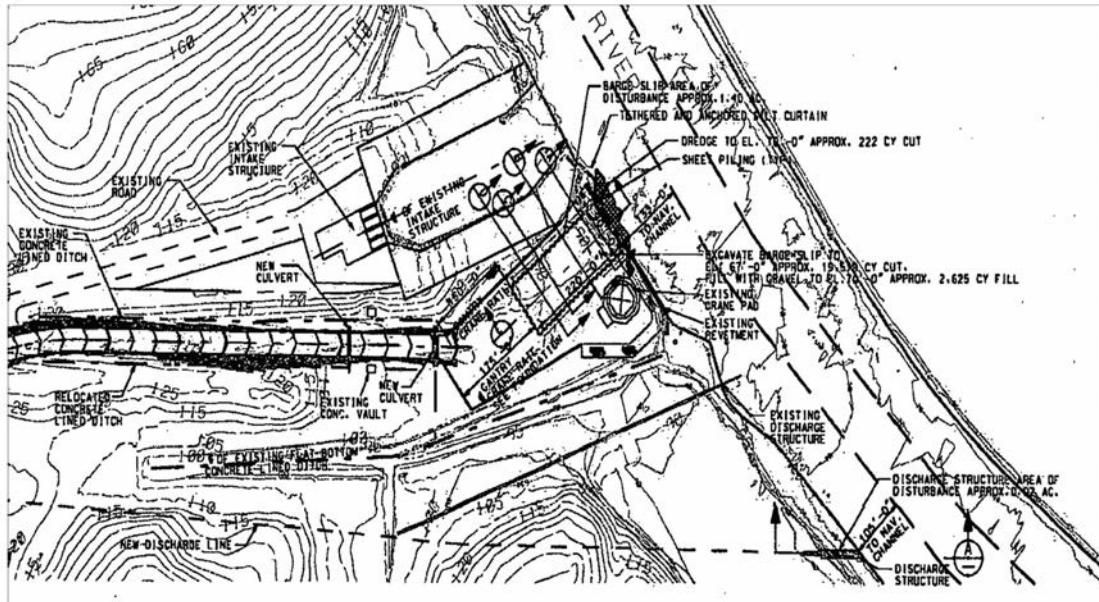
Plan View of Proposed Barge Slip (Southern 2007c)
